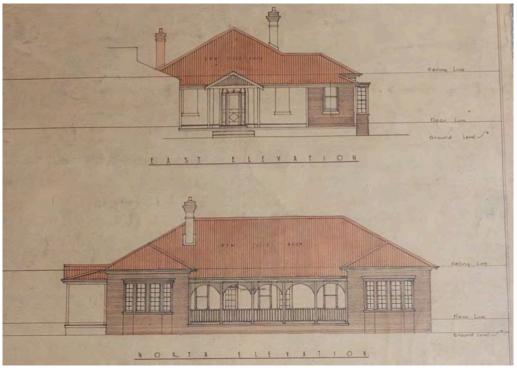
East and north elevations in plan for 'Alterations & Additions to Head Masters House, Barker College', prepared by Joseland & Gilling, architects, and signed by contractor J. Harper on 25 October 1928. (Source: Barker College Archives, Plan M0005).
